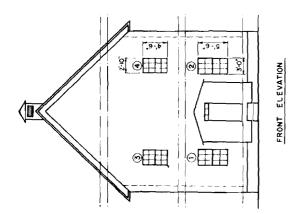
BUILDING No. 8 - TWO - STOREY SOLID BRICK SCHOOL WITH ONE - STOREY EXTENSION AT REAR
